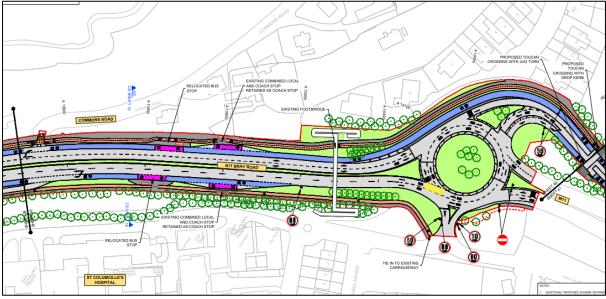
Extract from General Arrangement Drawings (Sheet 40)
